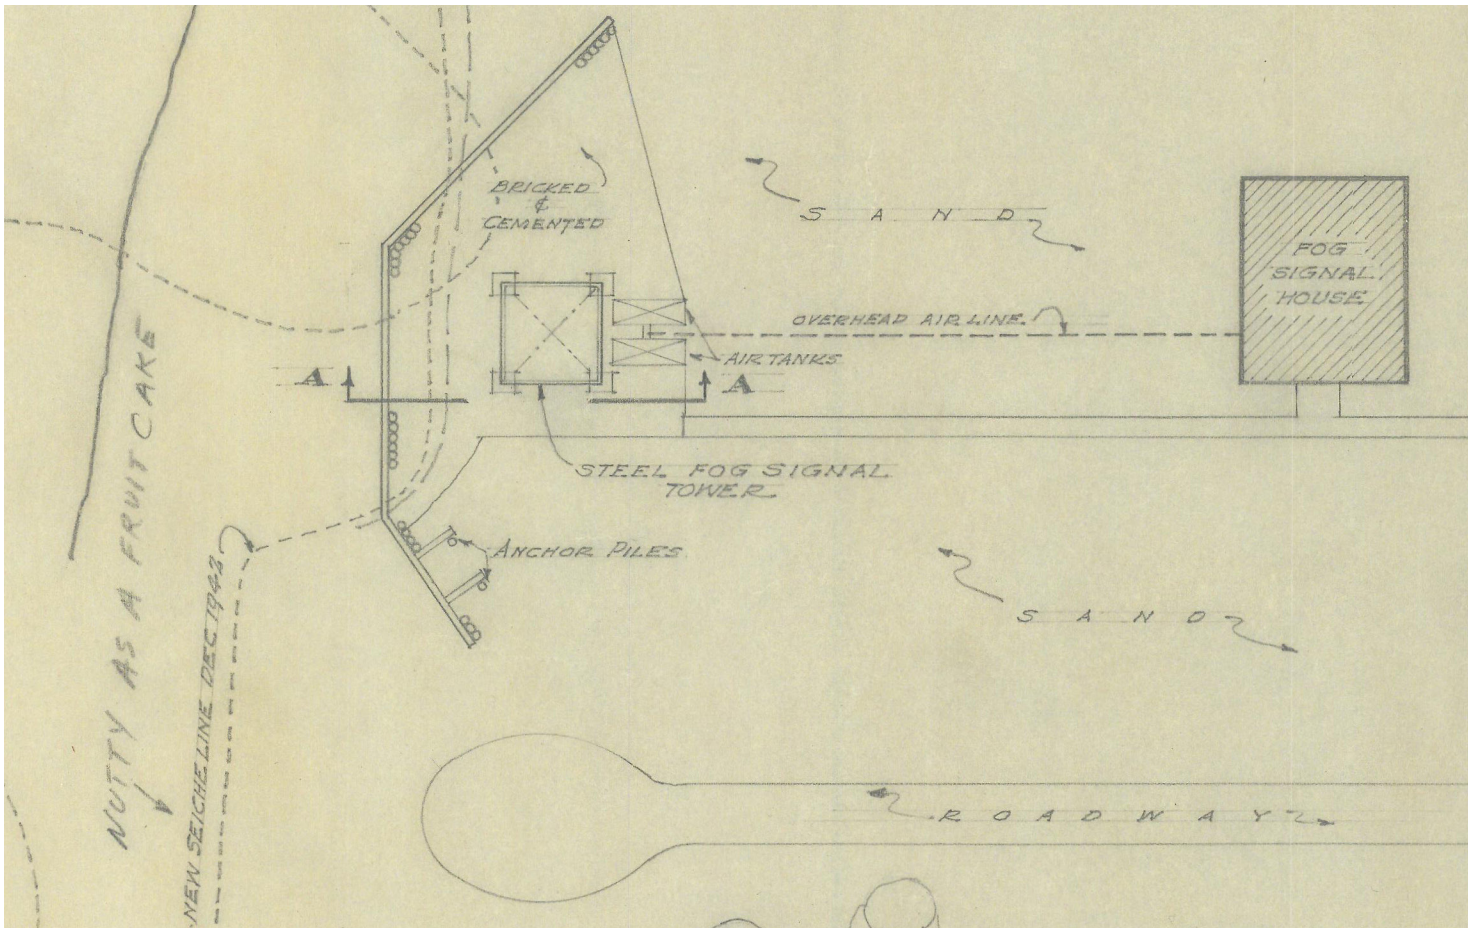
B-55: Drawing for temporary timber shore protection to be constructed around the new fog signal tower.
